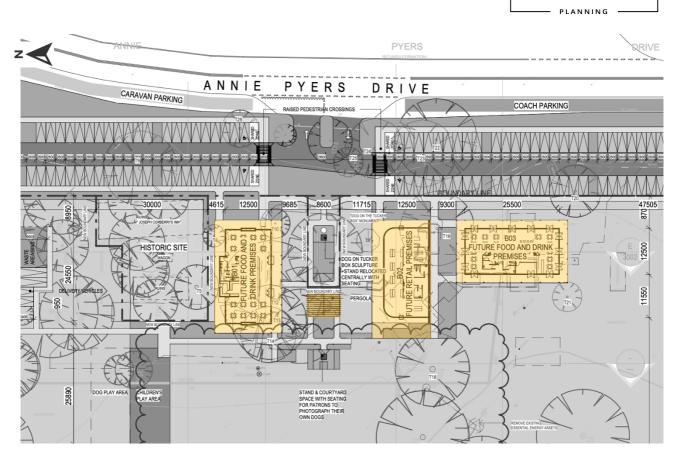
Extract from the architectural drawings showing arrangement of proposed buildings on the site
